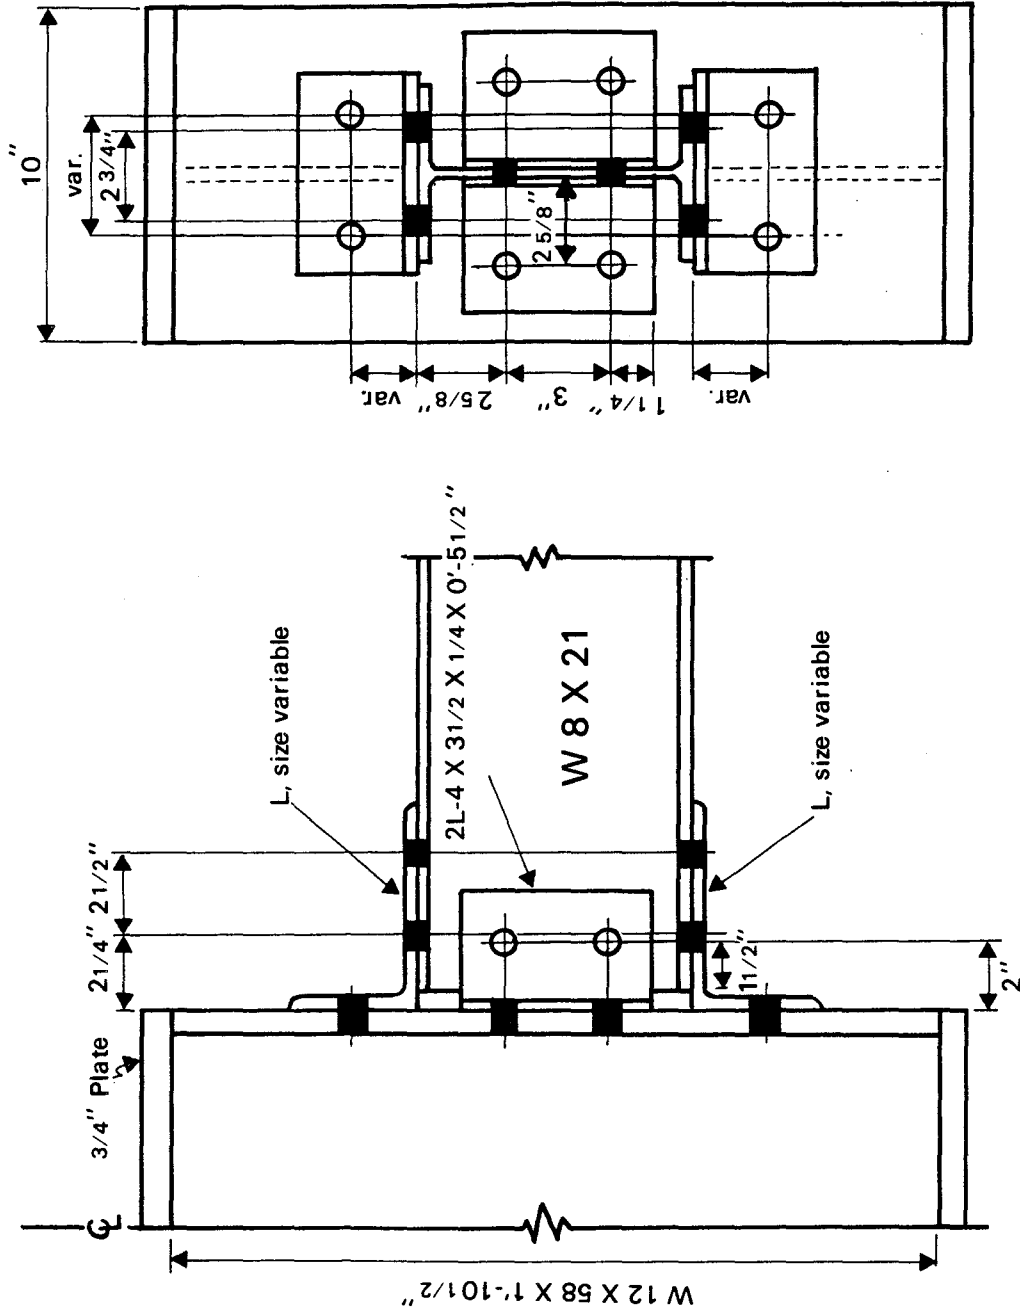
DETAILS OF CONNECTION FOR W8X21 BEAM — BOLTED SPECIMENS
